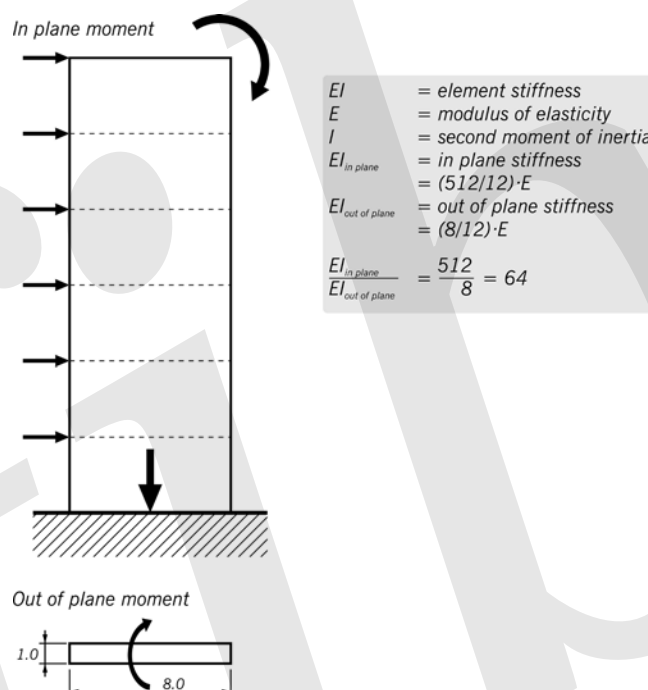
Example of comparable wall stiffnesses for in plane and out of plane bending.
